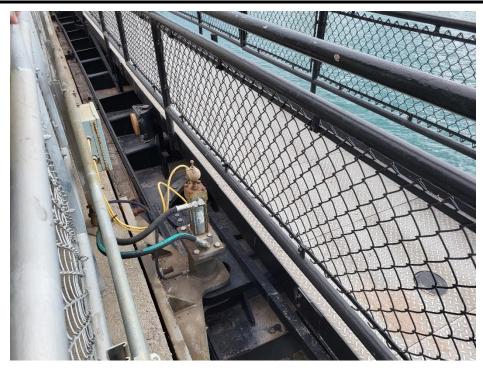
Miter gate latch Soo Locks Poe Lock
